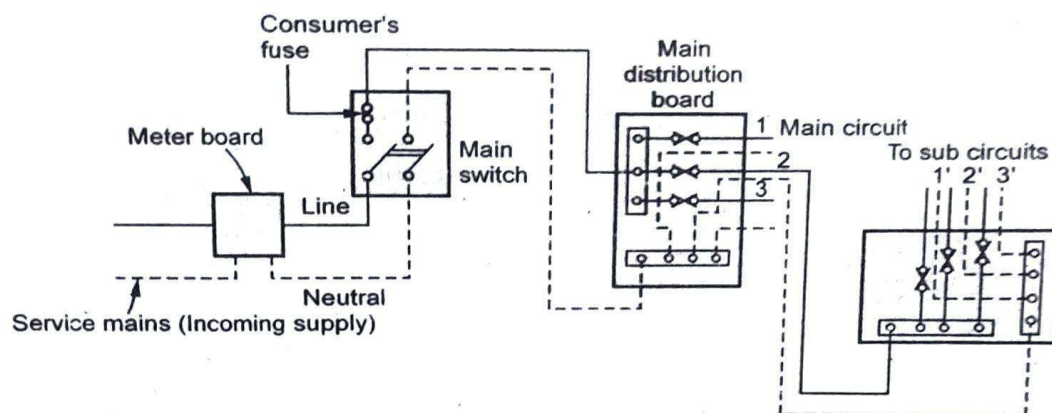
Typical layout of domestic consumer panel wiring scheme.
